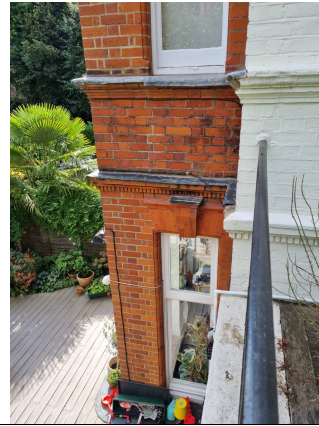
View of rear elevation to 3 Lyndhurst Gdns.
